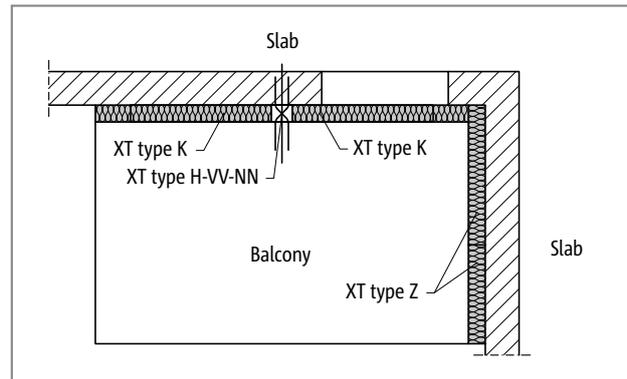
Schöck Isokorb® XT type H: Balcony freely cantilevered
